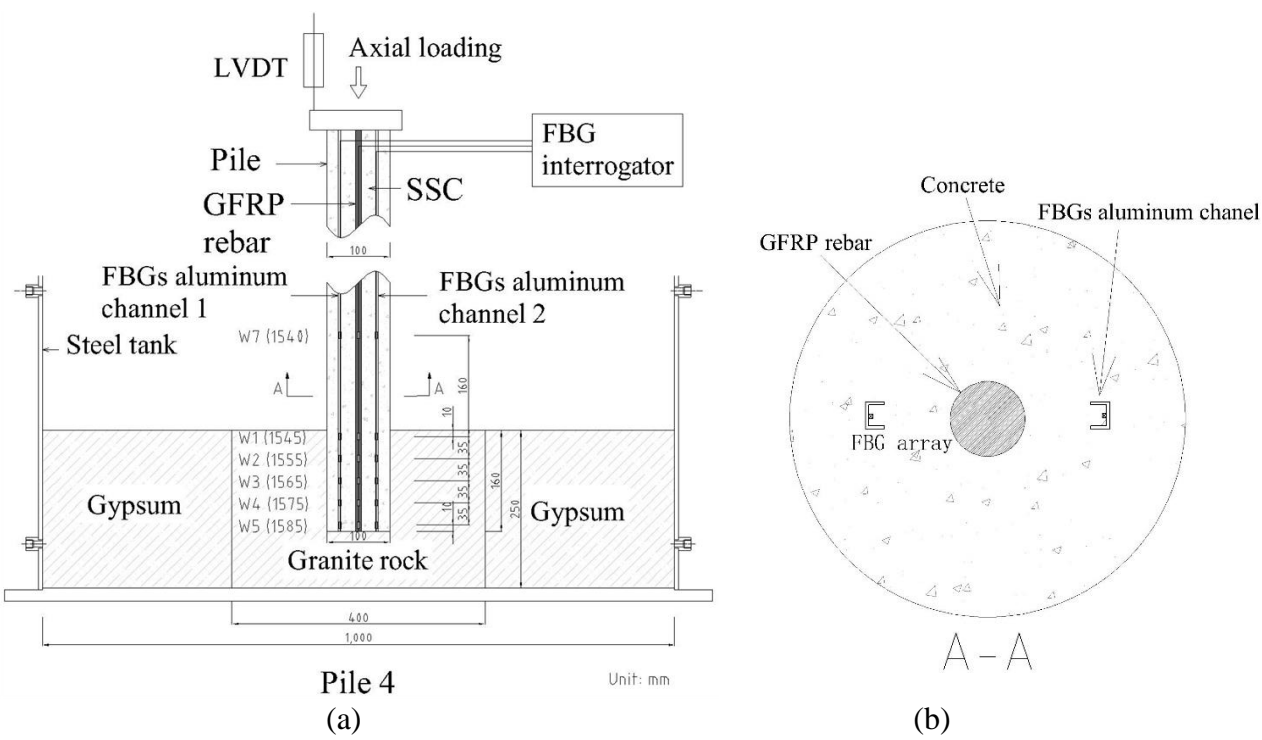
Cross-section illustrations of: (a) vertical profile of Pile 4, and (b) horizontal profile of Pile 4
